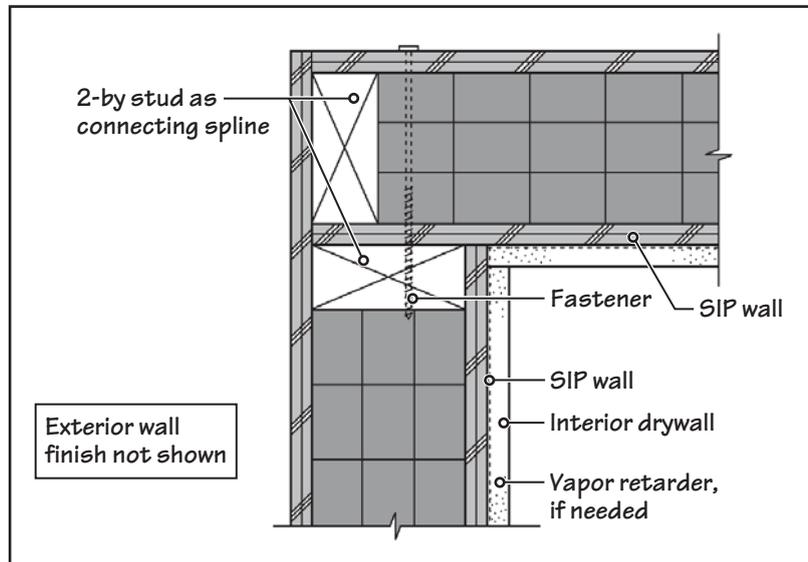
Typical connection at the corner of two structural insulated wall panels. This detail is keyed to Figure 17.4.
